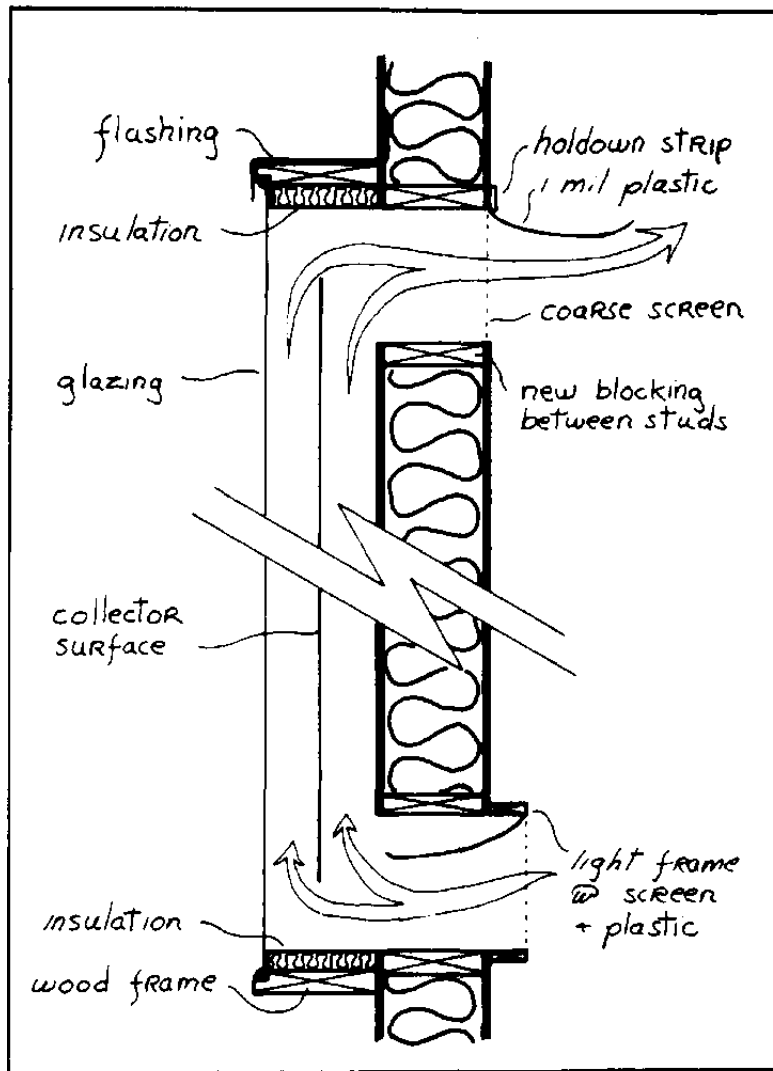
Simplified construction details - convective loop collector for existing walls. Note plastic backdraft damper (MOR-1)
